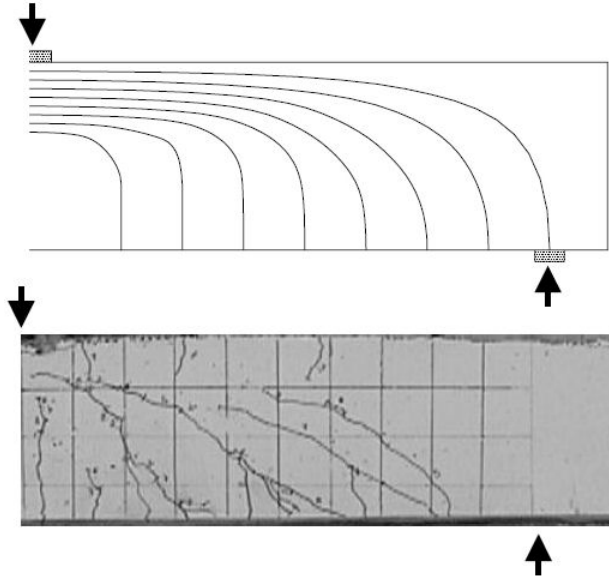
Principal compressive stress trajectories in an uncracked beam and photograph of a cracked reinforced concrete beam
